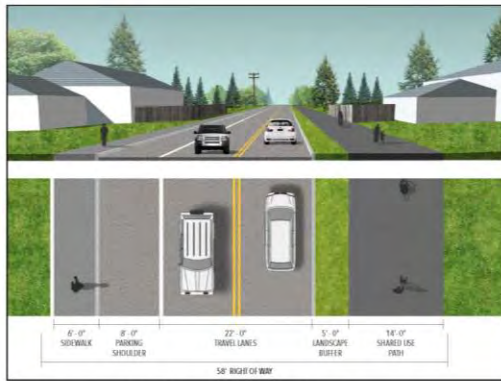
Buxton Road to S Troutdale Road route and sections.
